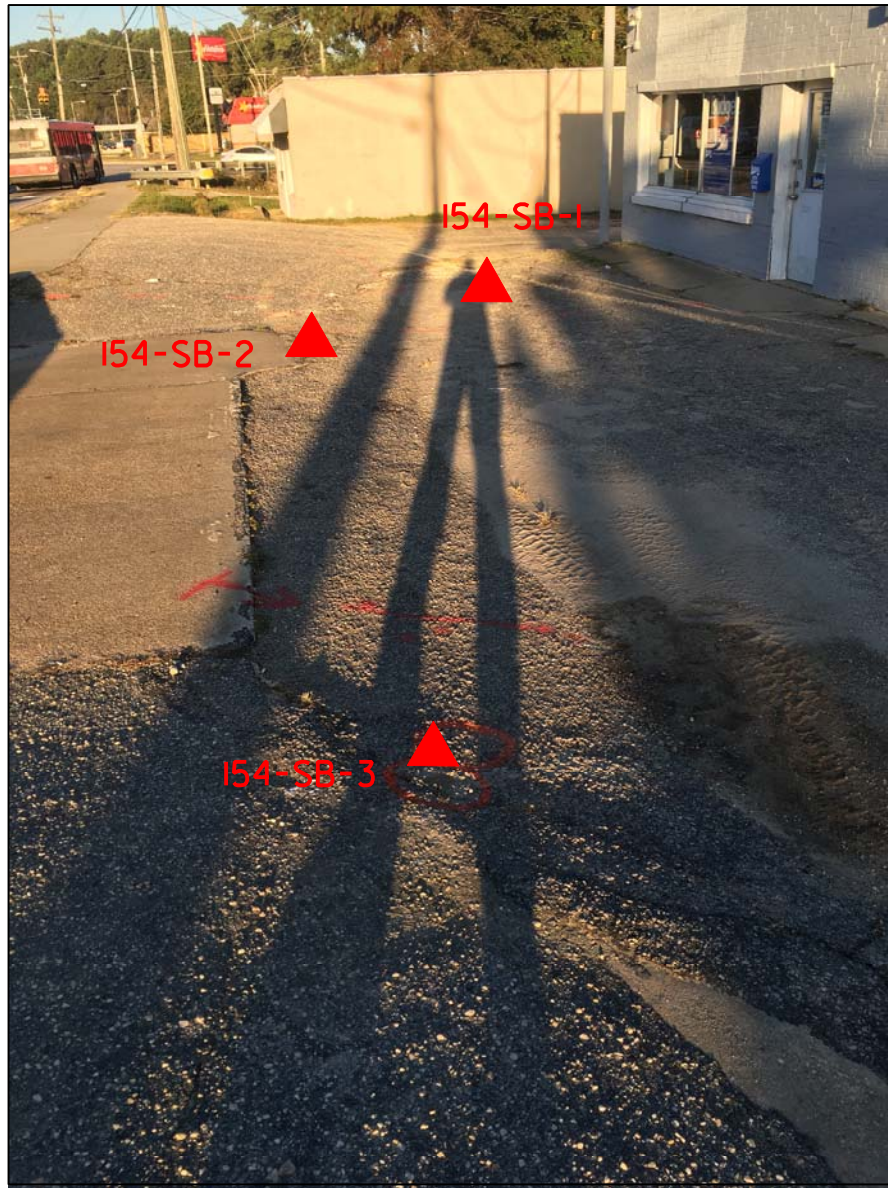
VIEW OF SOIL BORINGS LOOKING WEST
